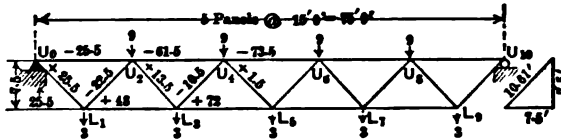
Dead Panel Loads and Index Stresses. Single-Track Deck Warren Truss Railroad Bridge.
